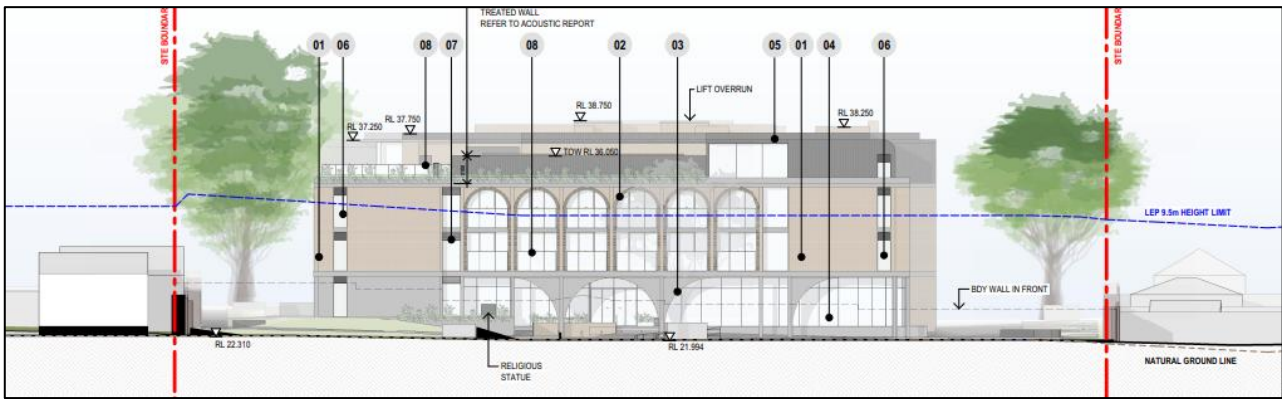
| Eastern Elevation – Marrickville Avenue (Source: RtS)
